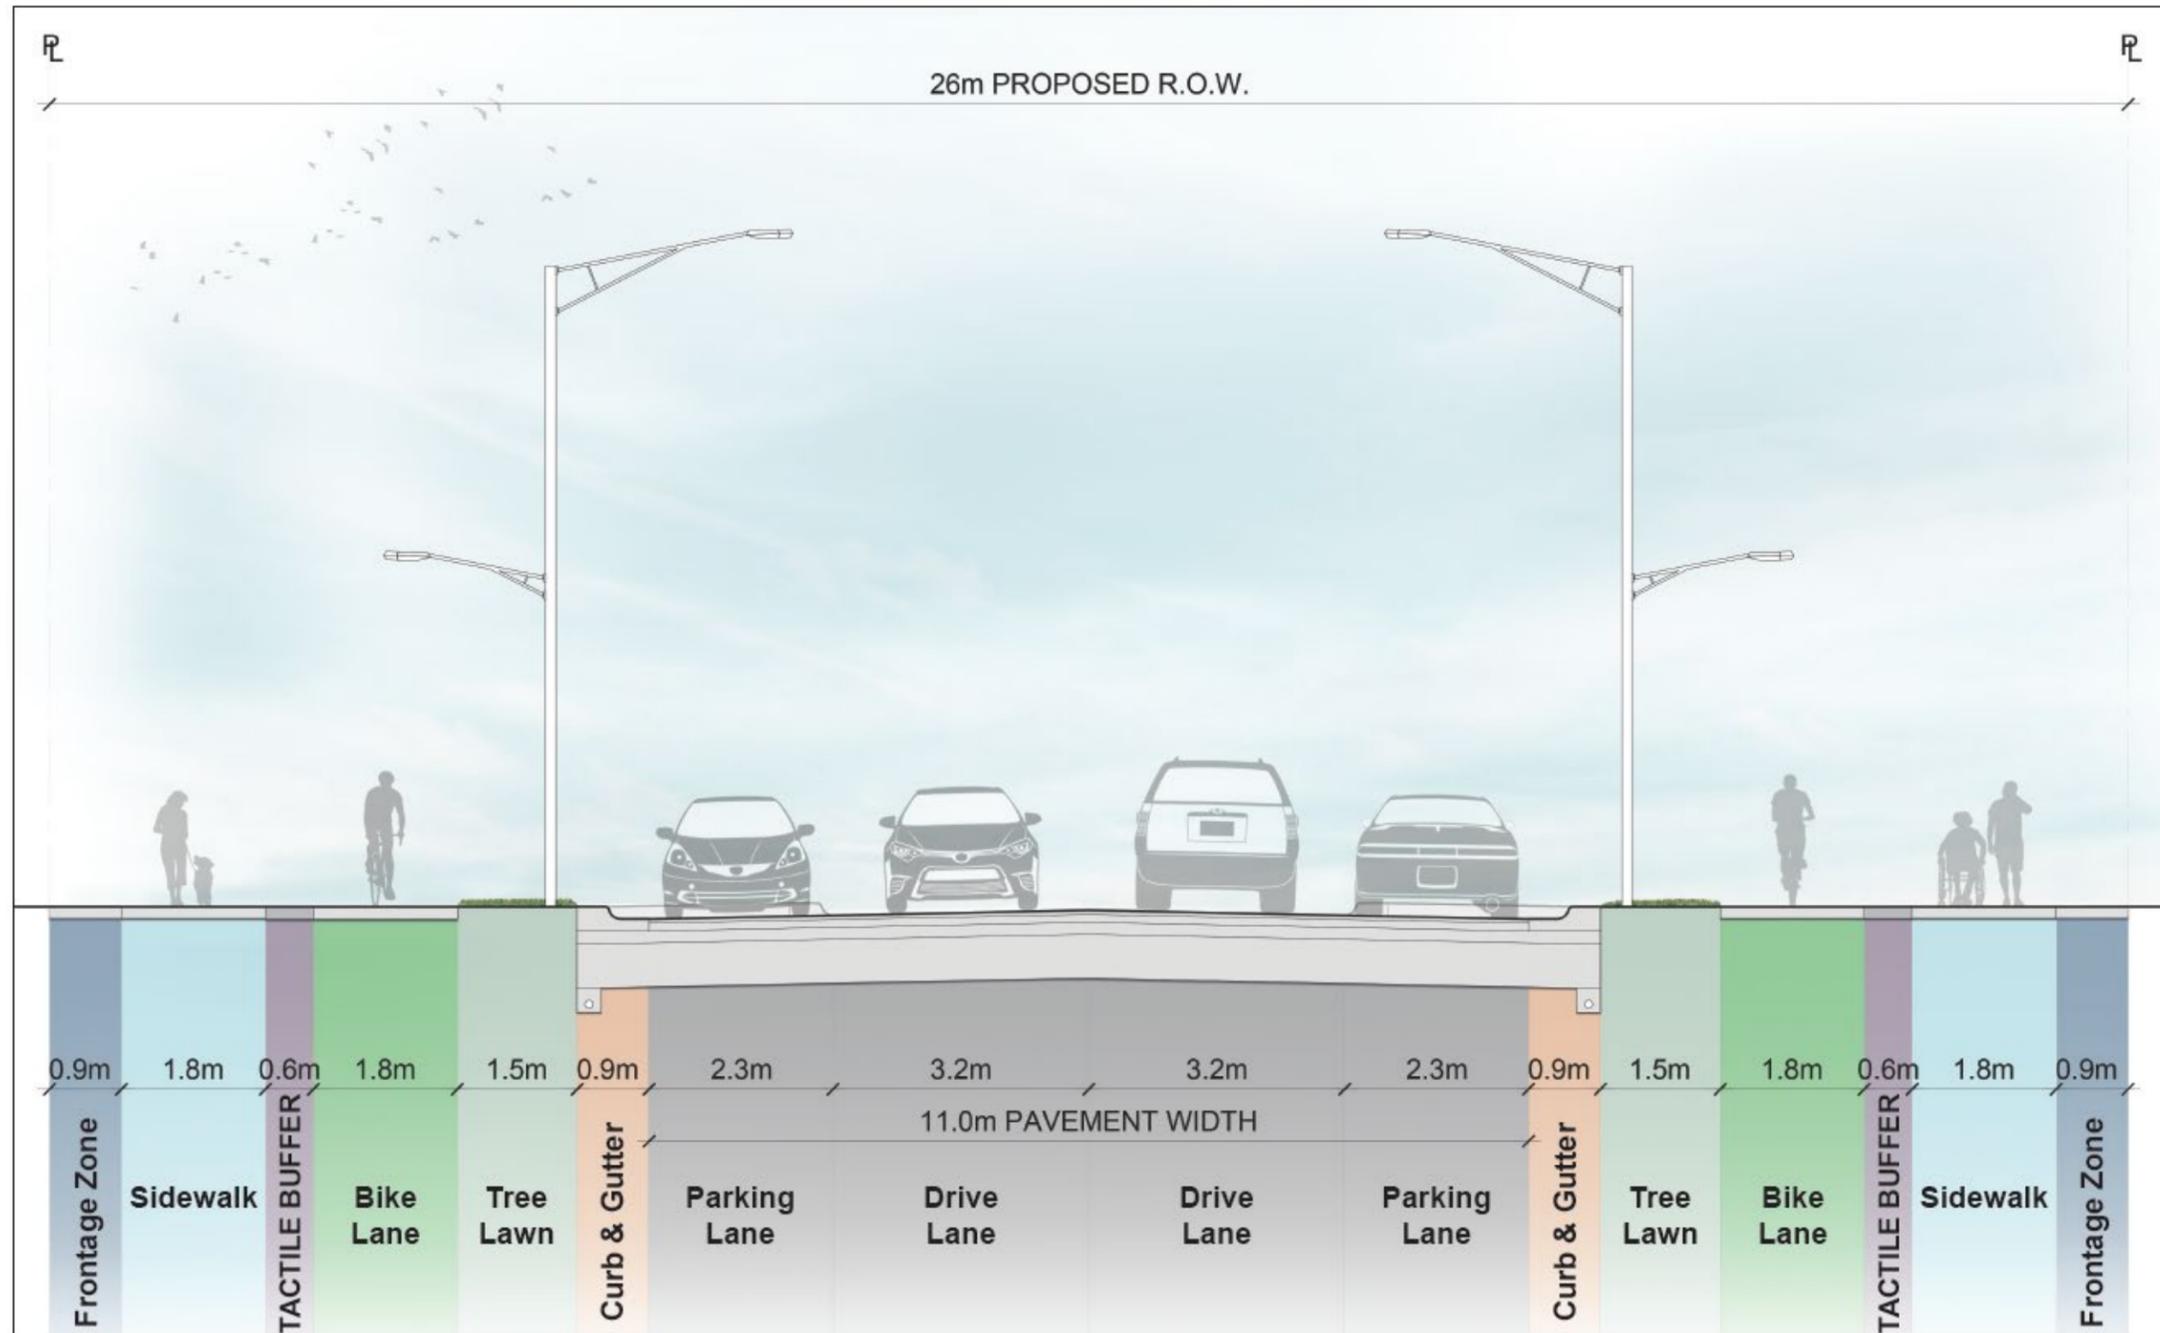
Neighbourhood Connector Street – Conceptual Application B (New Road)
